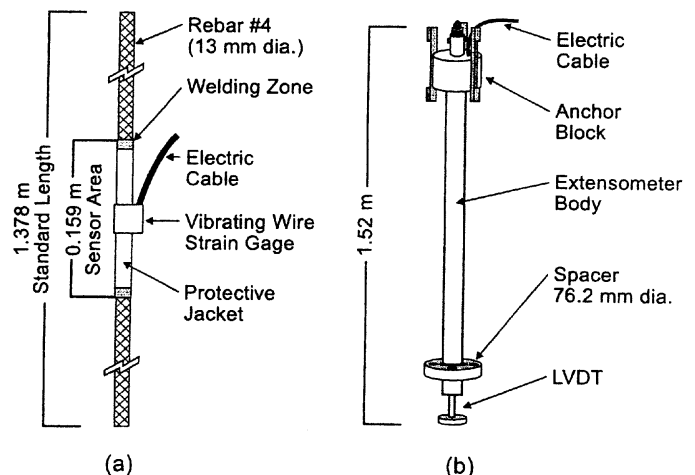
Pile Instrumentation: (a) Sister Bars; (b) Removable Extensometers
